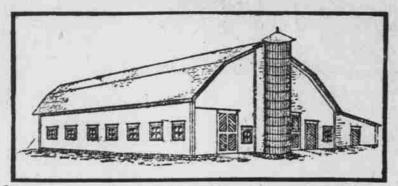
DETAILED PLAN FOR PRACTICAL FARM BUILDING
